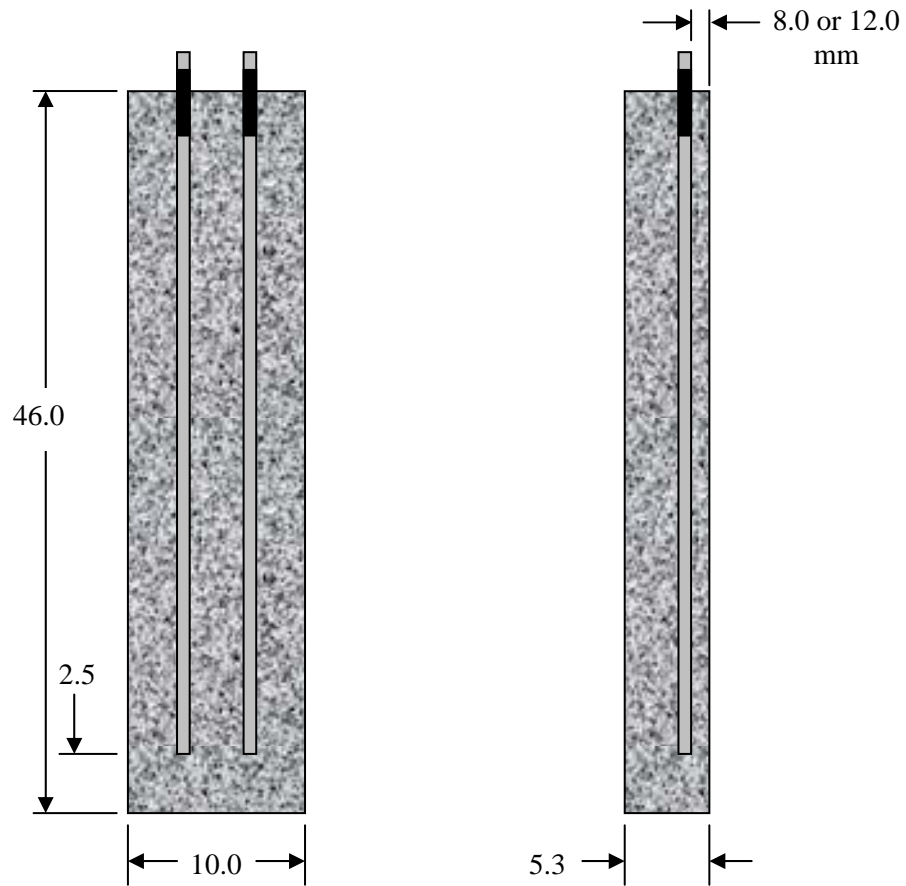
Schematic illustration of the simulated piling specimens (dimensions in cm excepted where noted otherwise).
